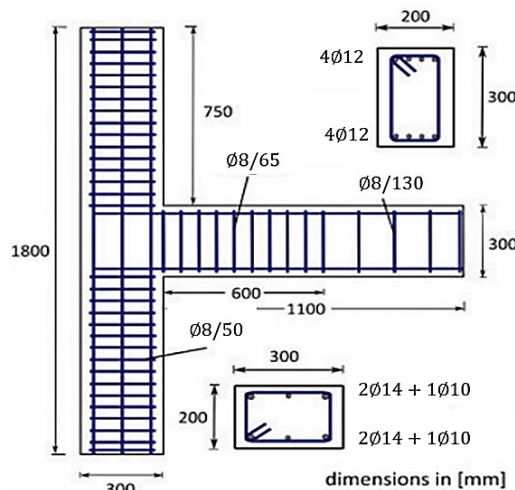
Geometry of the analysed RC joint and reinforcement detailing of the cross sections
